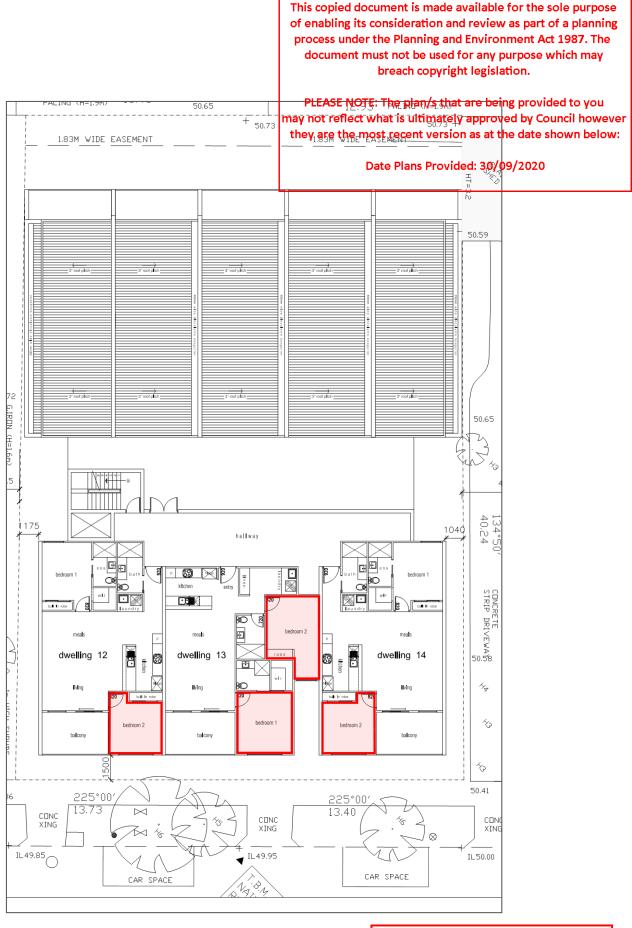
Ceiling / Roof Demarcations – Level WYNDHAM CITY COUNCIL (Image Source: TM Design Group)
